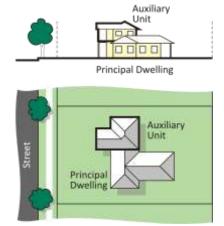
Layout of an Auxiliary Unit located above the Principal Dwelling
